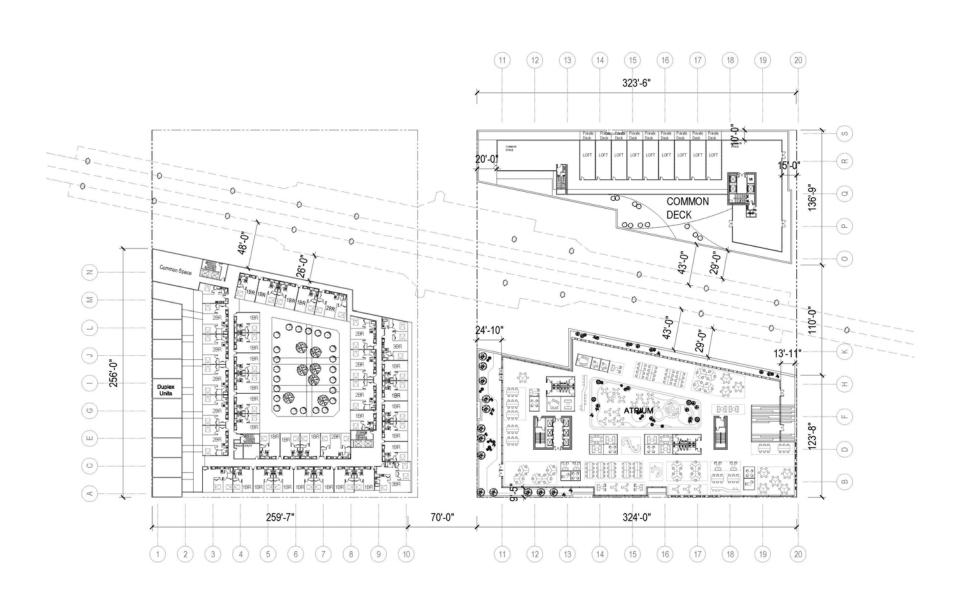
Floor Plan, 3<sup>rd</sup>-4<sup>th</sup> Floors
